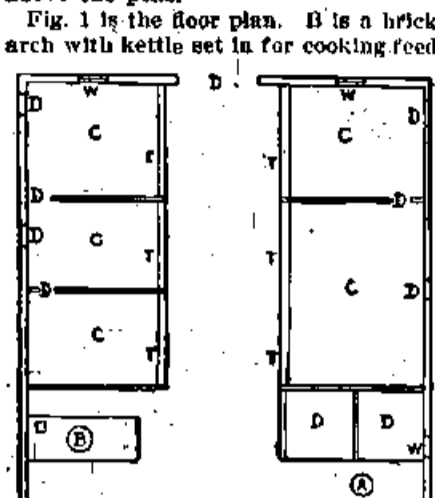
FLOOR PLAN OF HOGHOUSE.
